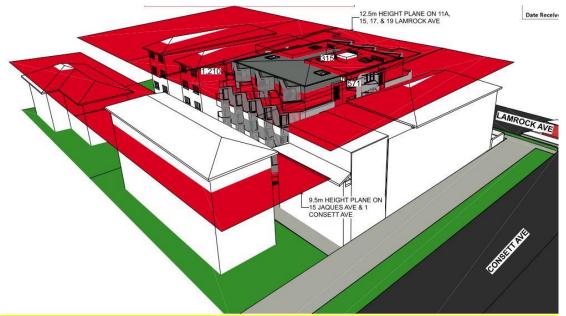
Extract of 3D Model of the height plane and area of where the development exceeds the height of buildings development standard (Source: Mark Shapiro Architects)
